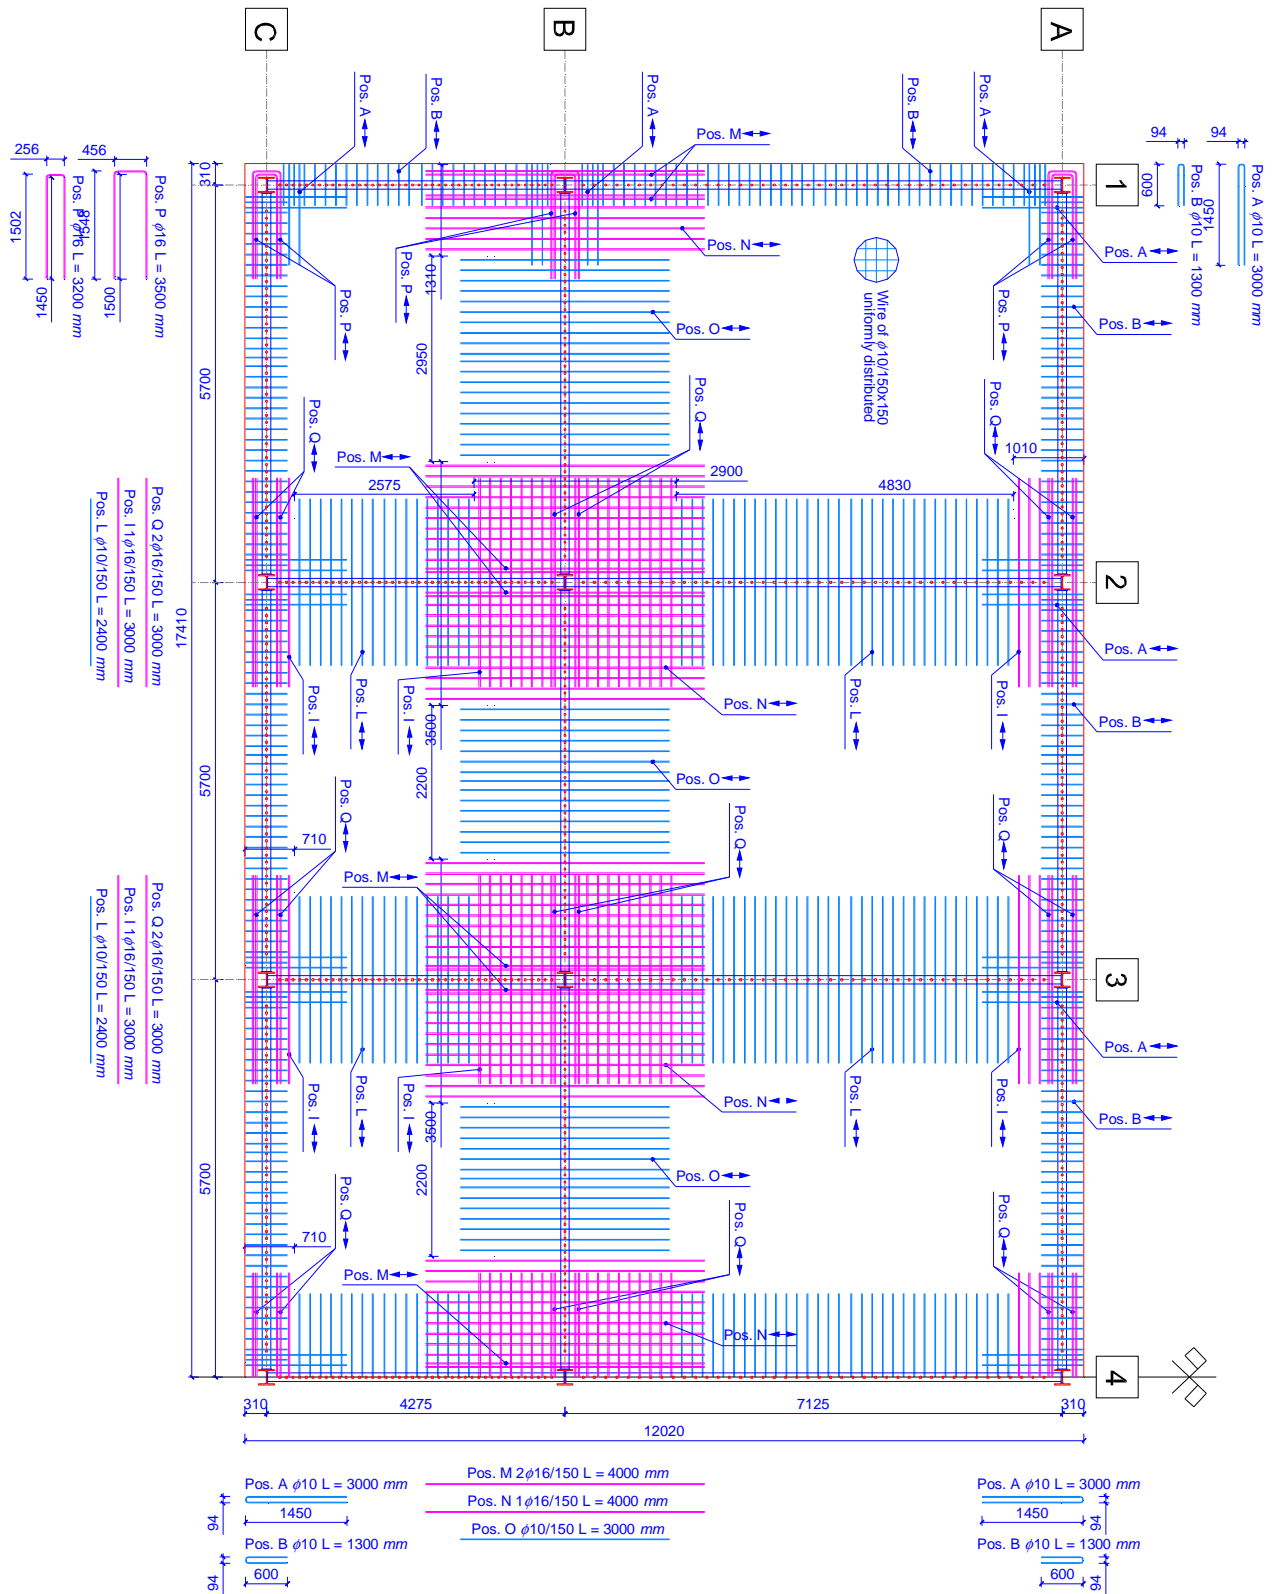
Slab Rebars - Upper Side – Asymmetric Configuration (length unit mm)
